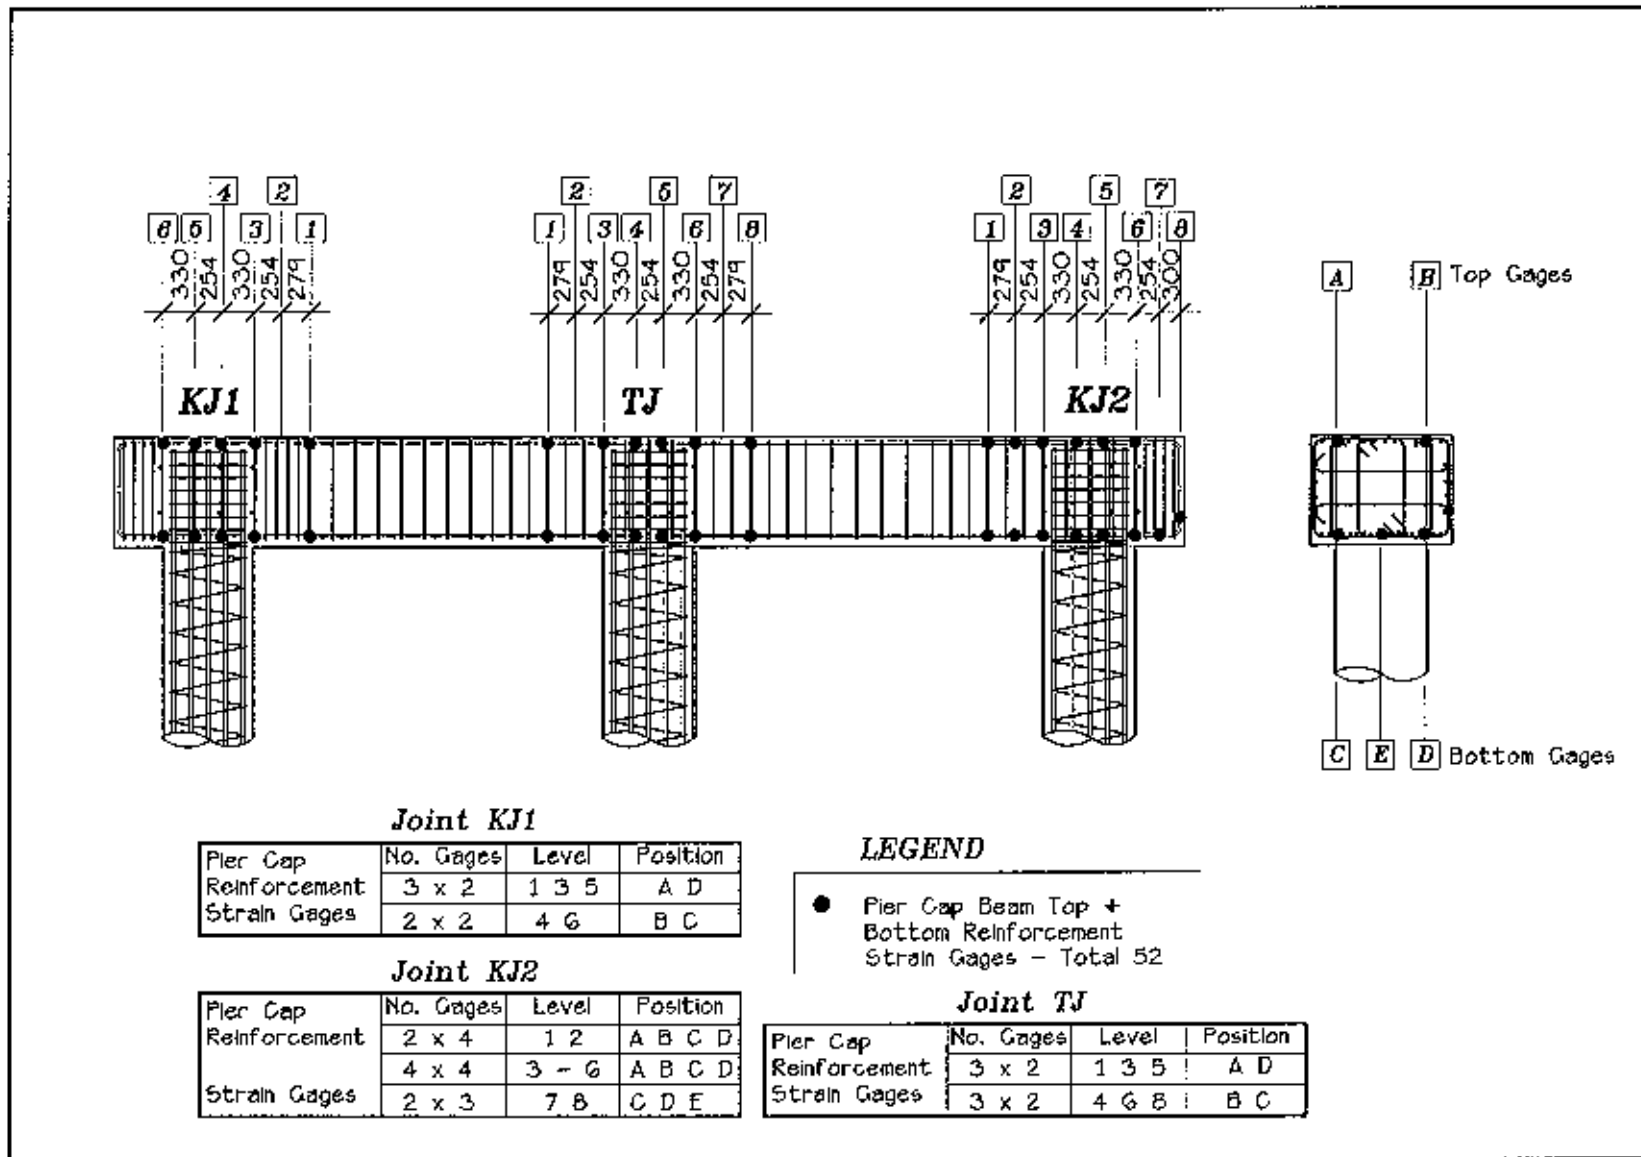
Cap Beam Top and Bottom Longitudinal Reinforcement Strain Gage Layout
